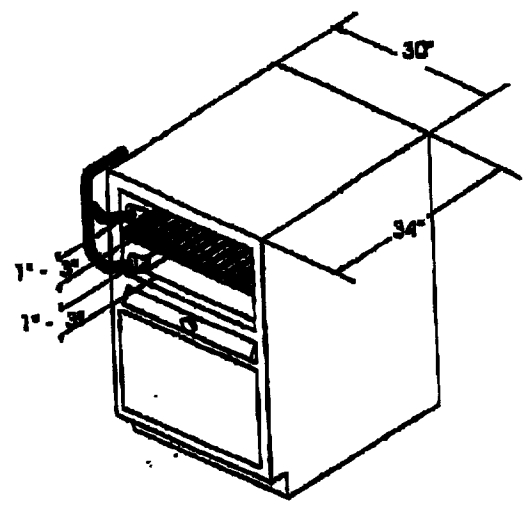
Model NL-UB Nozzle Placement, Upright Broiler.
